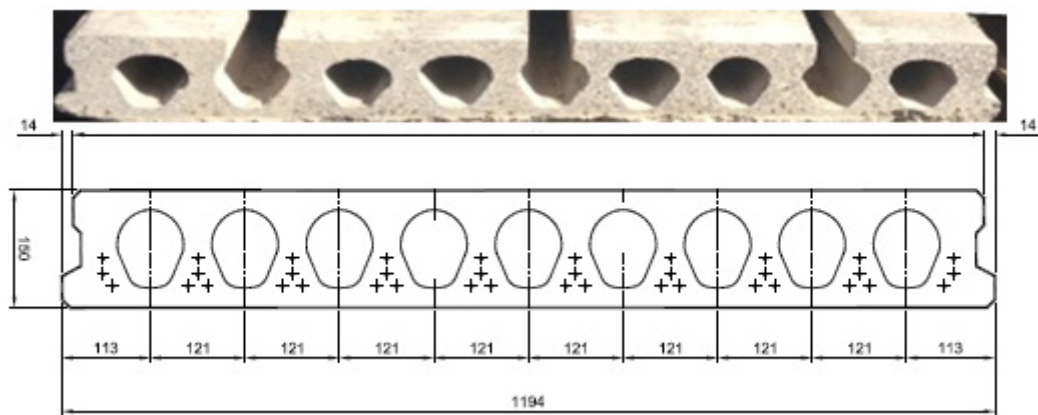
Precast concrete floor units used in the full scale test specimens (courtesy of Bison Ltd.)
